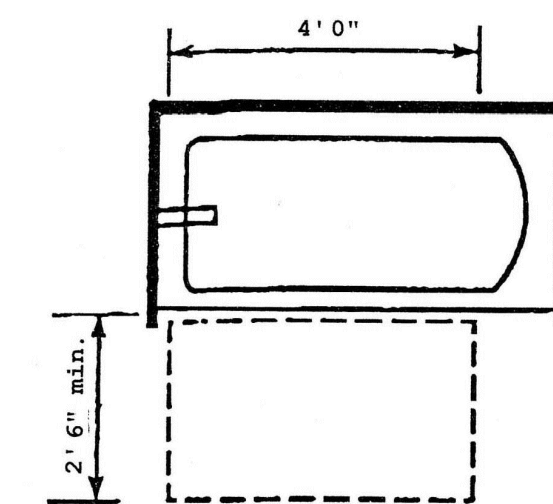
Alternative Specification - Clear Floor Space at Bathtub
